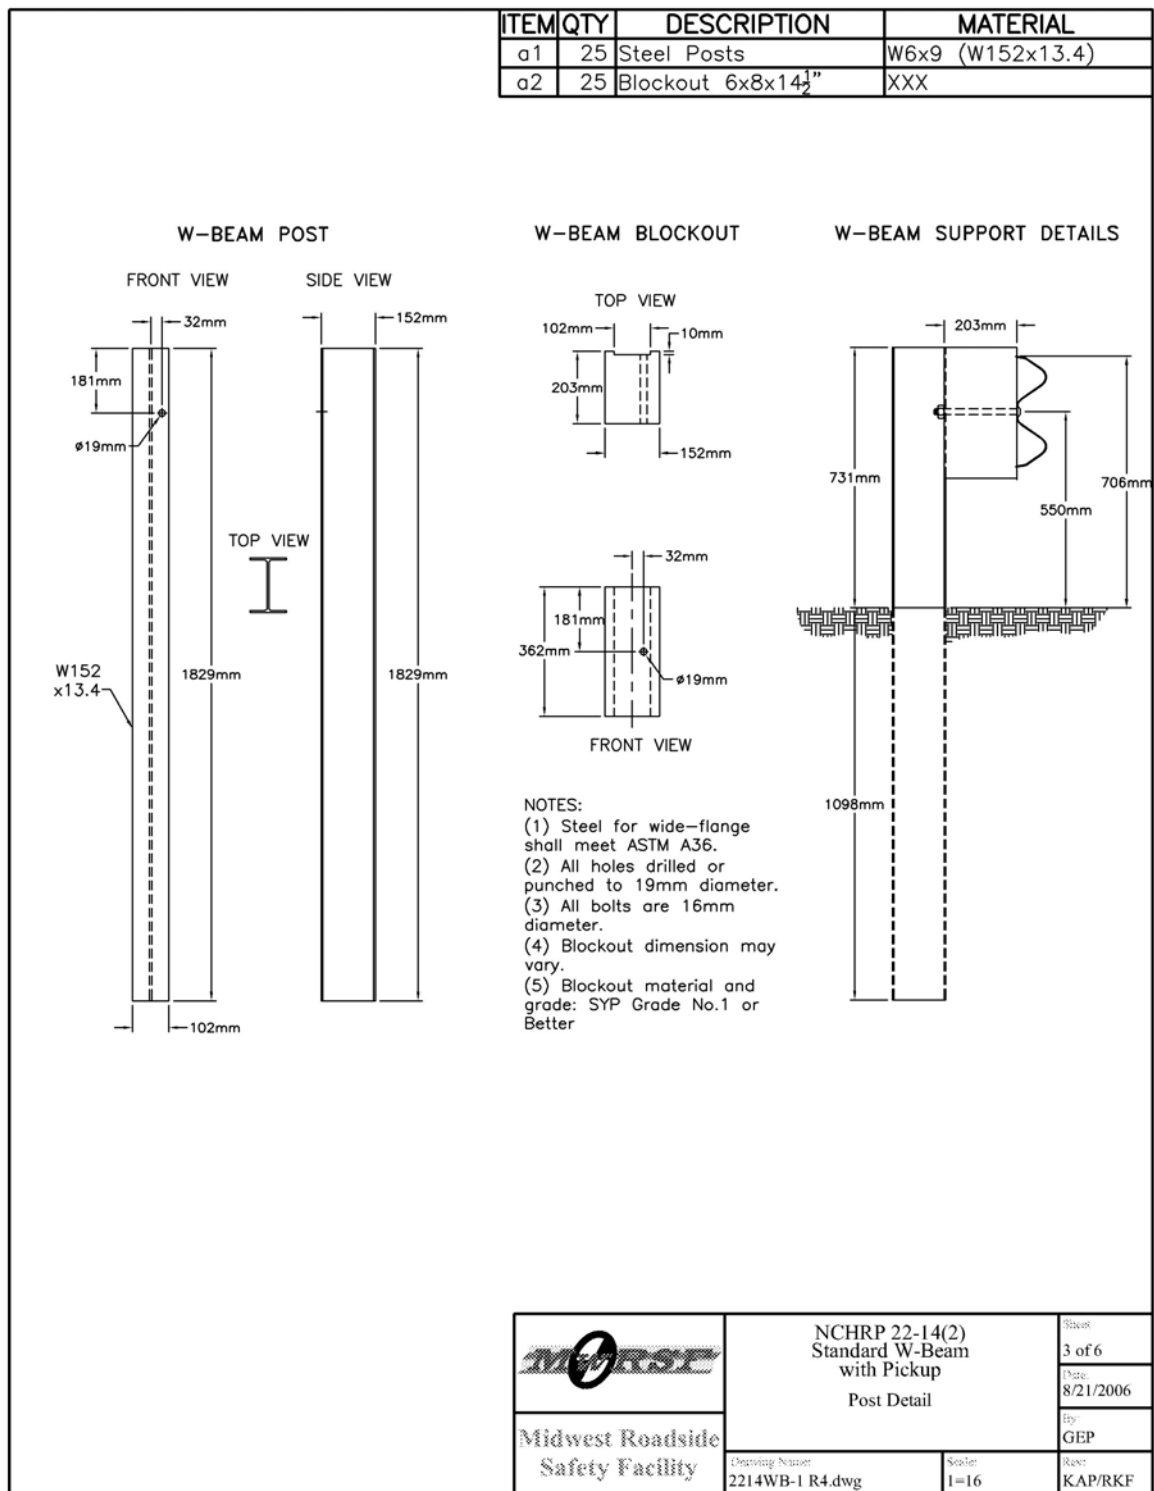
Standard Height, Strong Post, Wood Blockout W-Beam Guardrail Post Details
